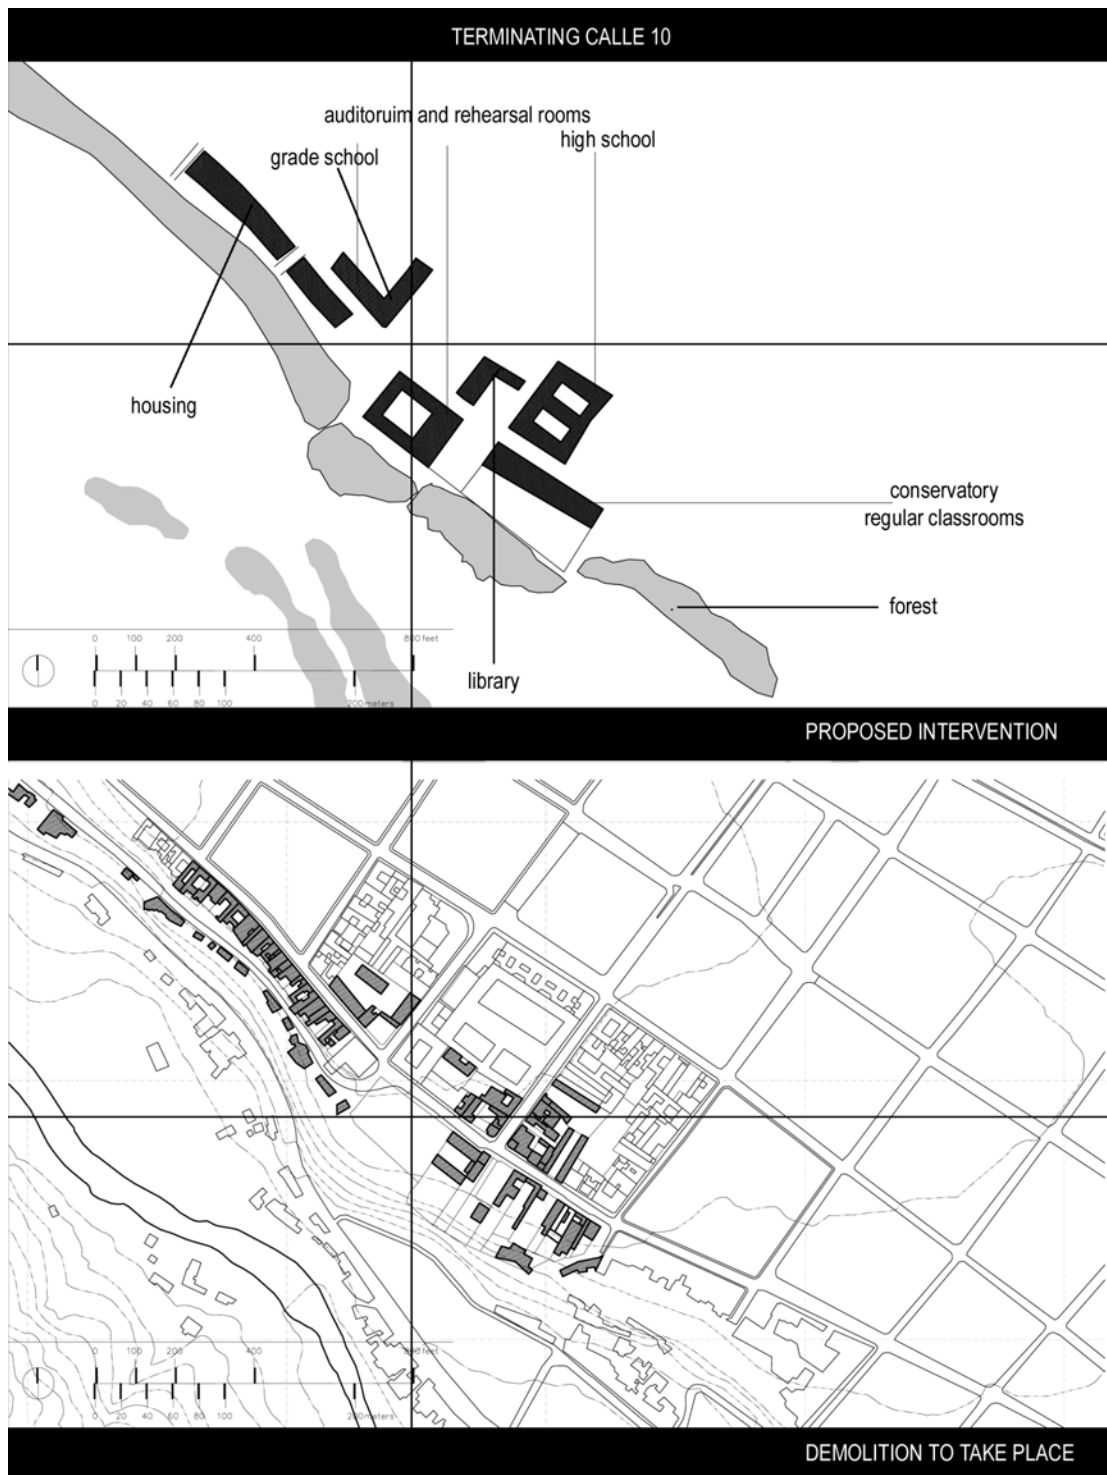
Proposed buildings and Demolition for “Terminating Calle 10” parti.
